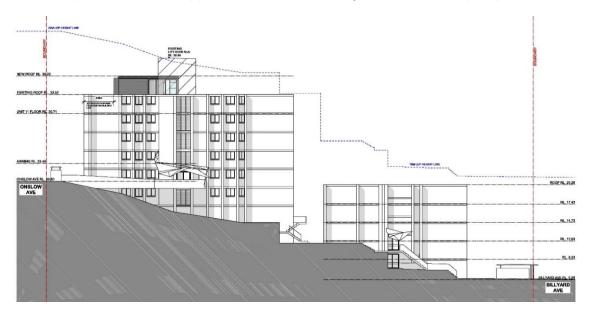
South elevation of existing building and proposed addition showing setback from Onslow Avenue and additional height in storey
